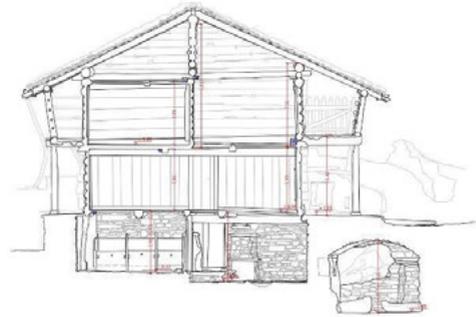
Transversal section drawing of House 1. At lower floor, stables and the living room divided by a wooden partition; at first floor bedrooms; at the upper floor warehouses reachable by an external wooden (Drawing by Verona).
